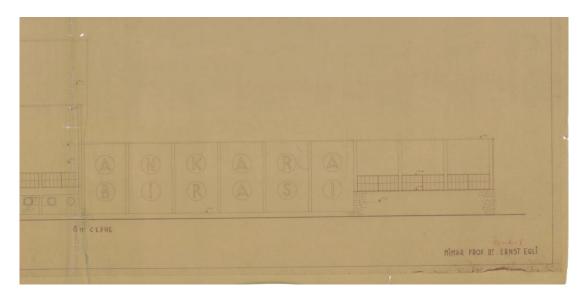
Original drawing of the beer settling building, the north facade, Ernst Egli, 1937 (Source: TTA Archive)
